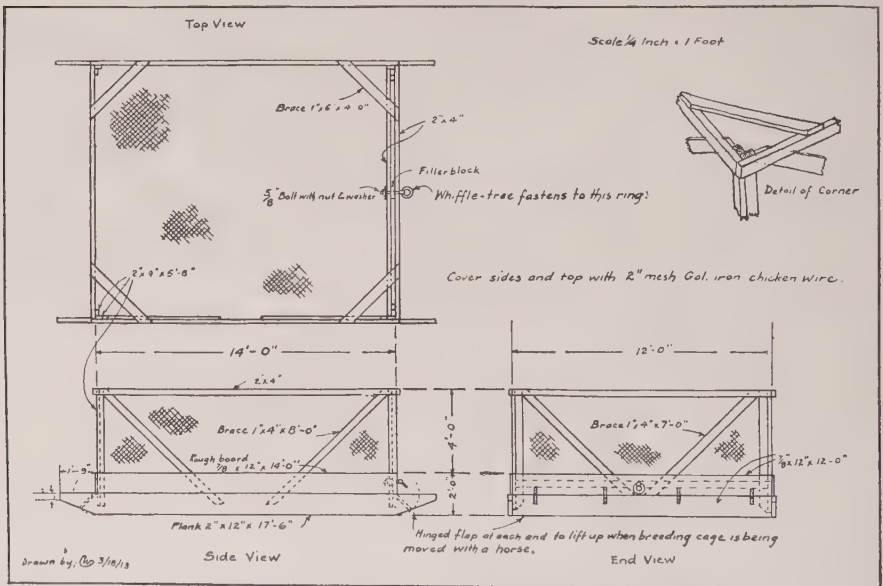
A.—Detailed Plan for construction of movable pen for adult ringnecks. (Figure 1 shows completed pen.)
